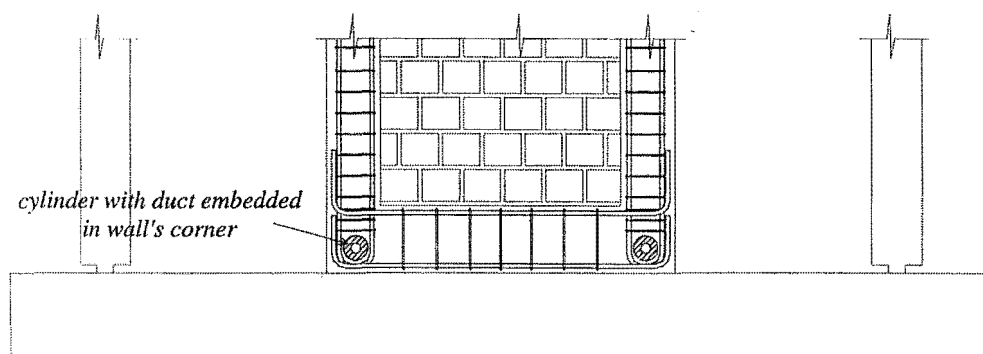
Steel tubes and reinforcement at the base-corners of the rocking-wall
